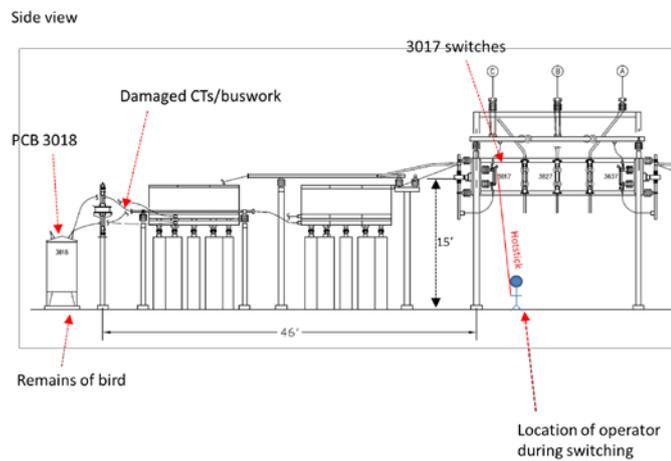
Side view photo - 3018 shunt reactor, with dimensions
